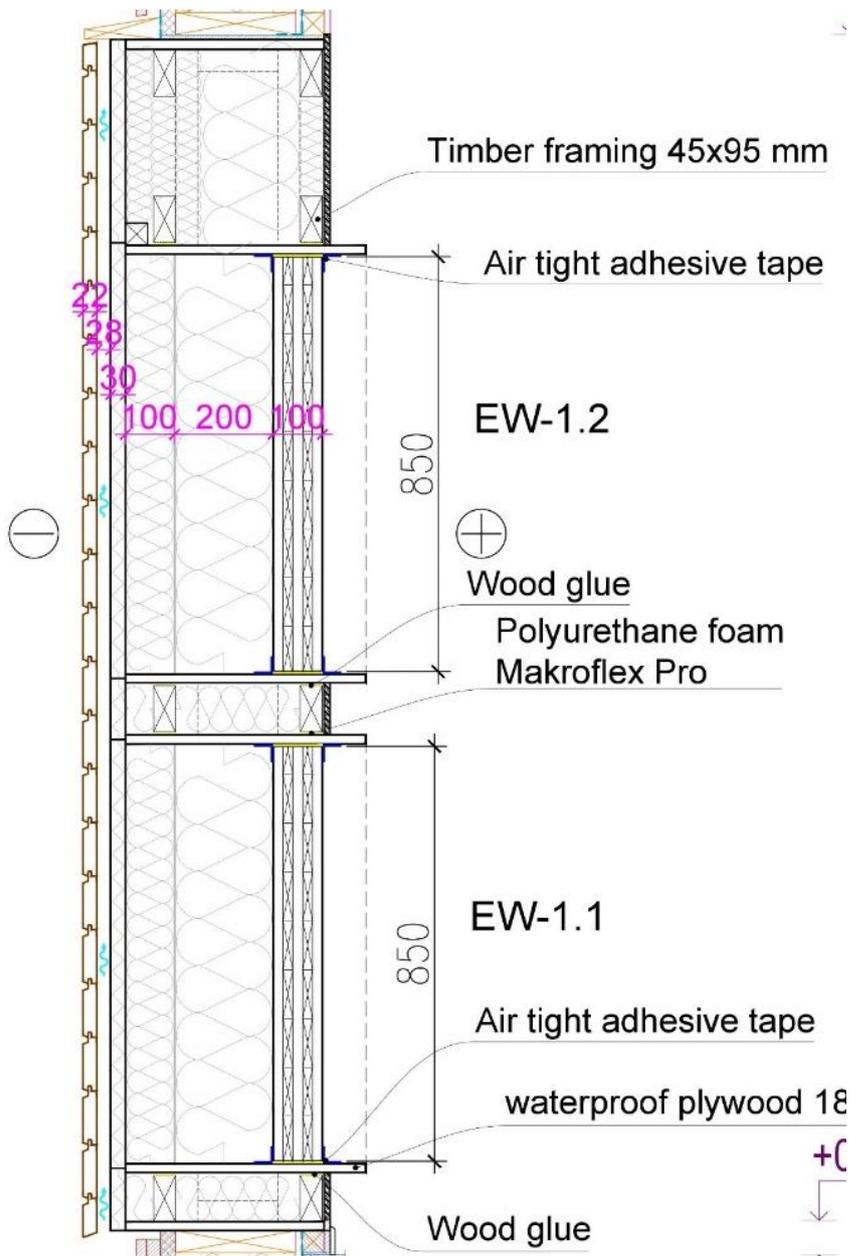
Section of test wall depicting different materials used in ensuring proper connection of the structure (Technical drawing by Villu Kukk adjusted by the author).
